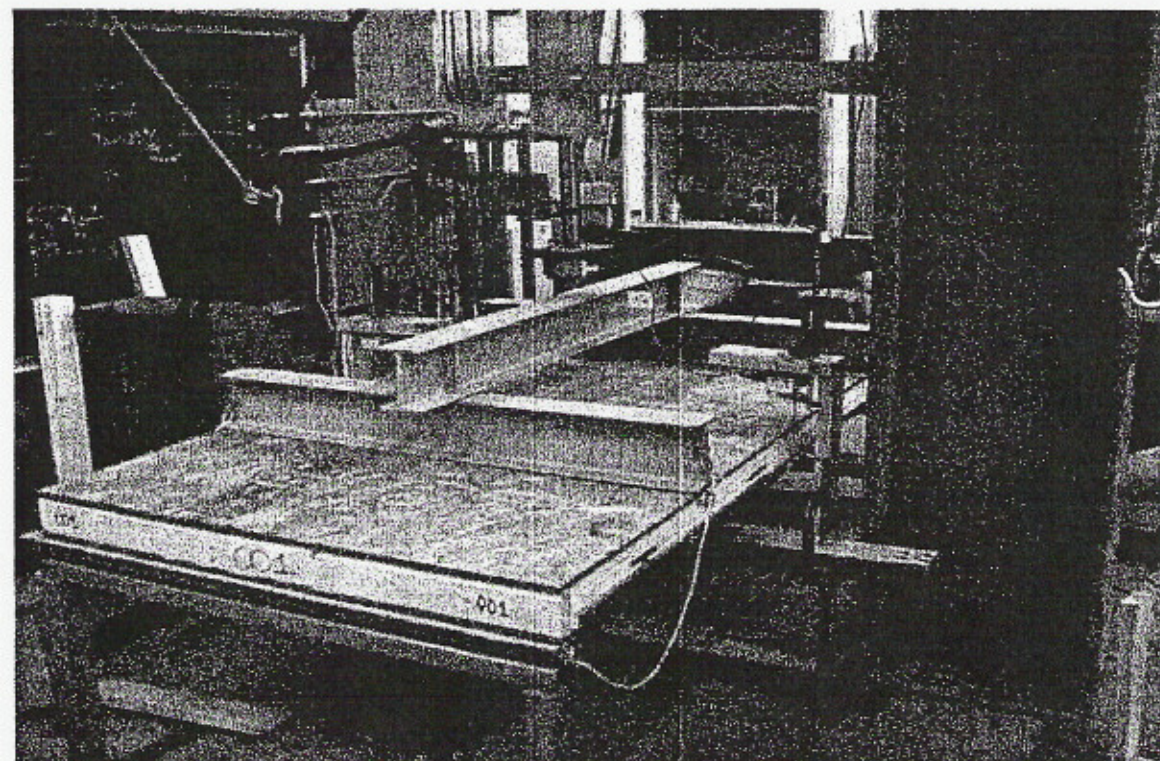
Test Setup for Transverse Loading on 8' OSB-OSB Panel
